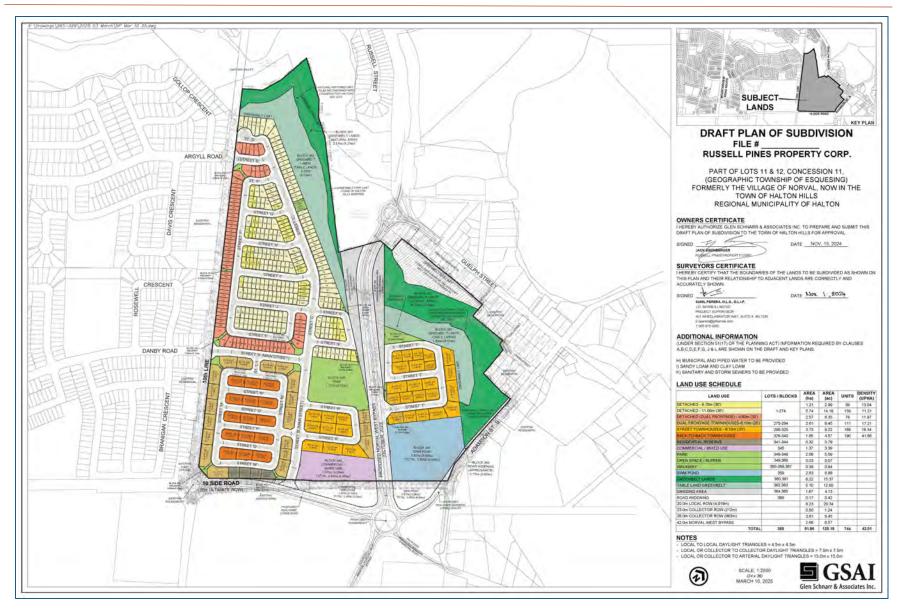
Draft Plan of Subdivision, Glen Schnarr & Associates Inc. (March 2025)
